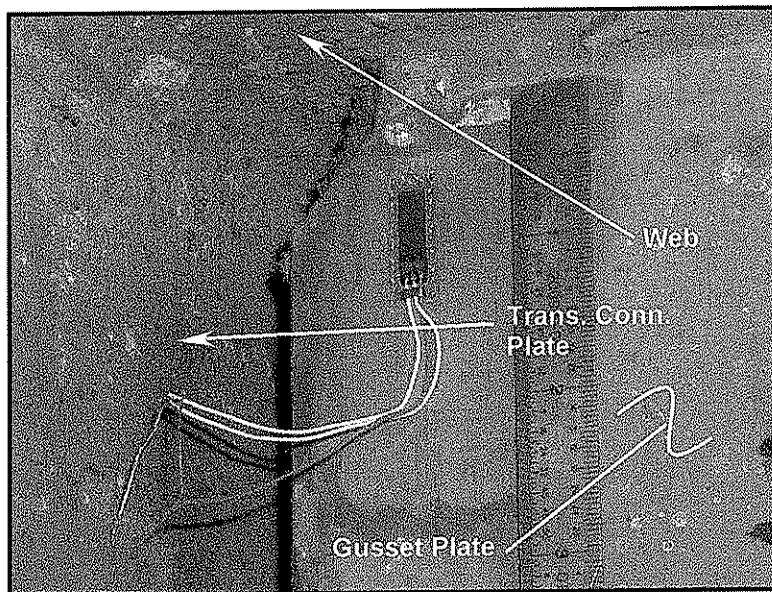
Photograph showing gap between transverse connection plate and gusset plate as built on the Kanawha River Bridge
